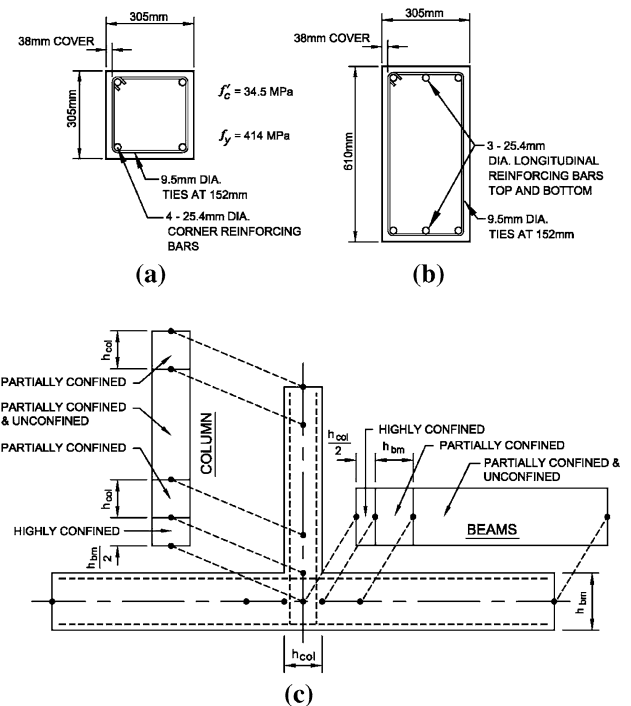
Member properties used in this study for the theoretical analysis of simulated reinforced concrete frames: a column cross section; b beam cross section; and c regions of concrete confinement.
